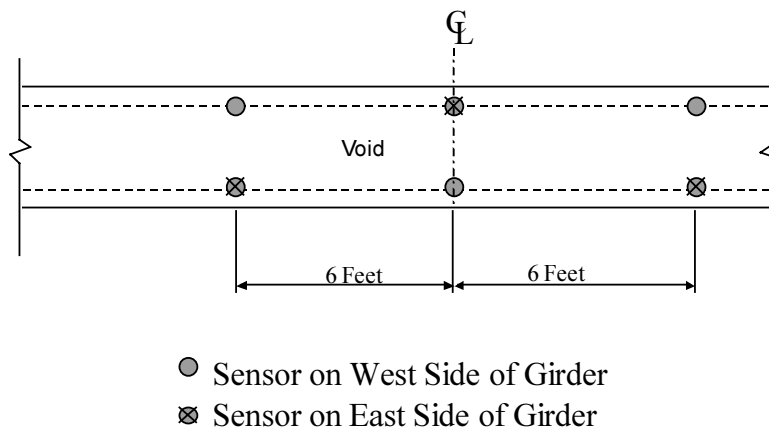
Plan View of Sensor Locations on Box Girder Specimens
